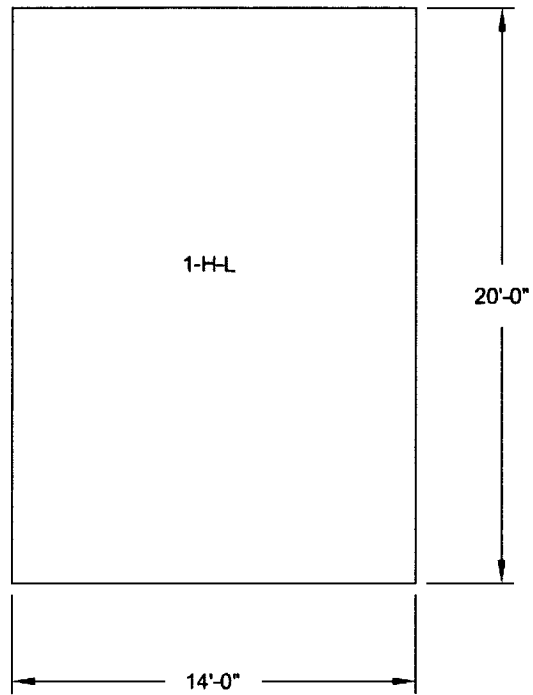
H.6-176 Wall 9 Looking From Outside Vertical Reinforcement Zones
